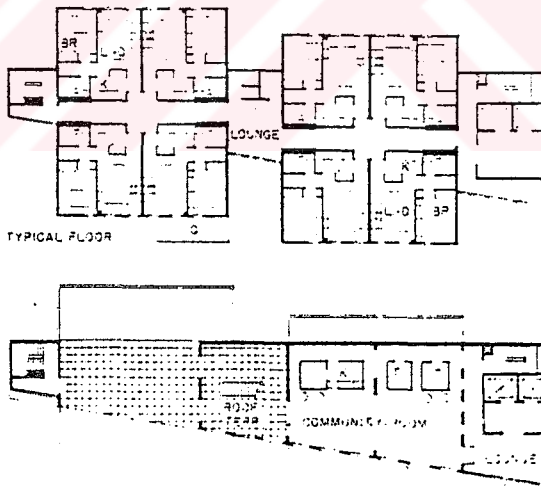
A Tall Building With Grouping Small Apartments For Elderies. Lincoln Towers, N.Jersey, USA
